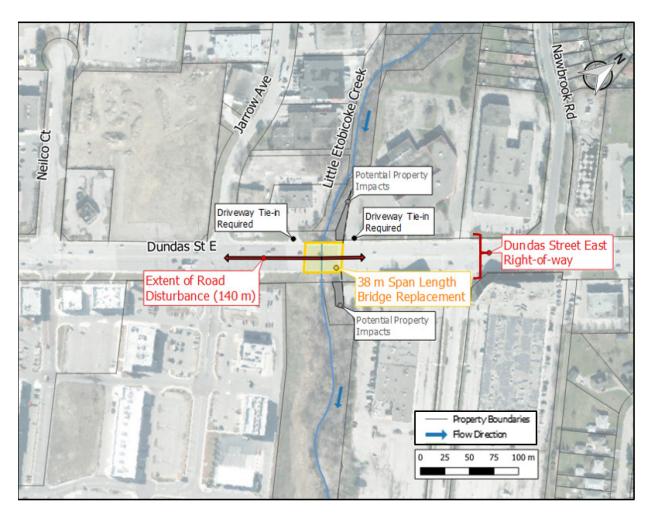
Dundas Area Alternative Solution 2: 38 m Span Bridge without Downstream Floodplain Conveyance Improvements
